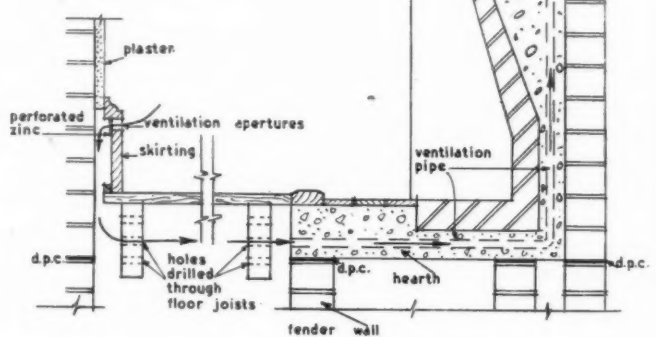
The traditional danger spot, where a suspended timber floor abuts a solid concrete floor. Damp will enter unless a vertical D.P.C. is included.
